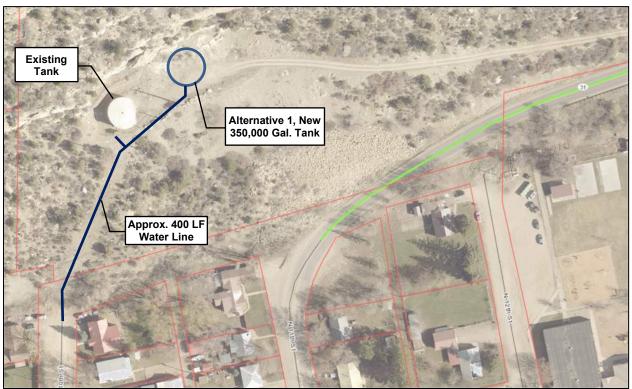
Tank Site Alternative 1, Existing Tank Site
